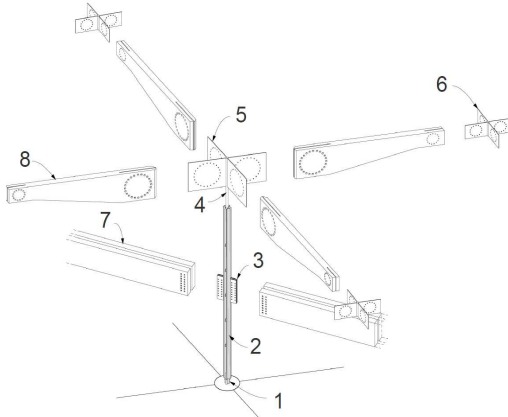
Primary structural elements (Image copyright: Edward Cullinan Architects) 1. Steel column foot; 2. Steel column; 3. 1st floor flitch plates with rectangular bolt pattern; 4. Steel column top rod; 5. Roof flitch plates with circular bolt pattern; 6. Roof centre span flitch node; 7. Glulam floor beams; 8. Glulam tapered roof beams
